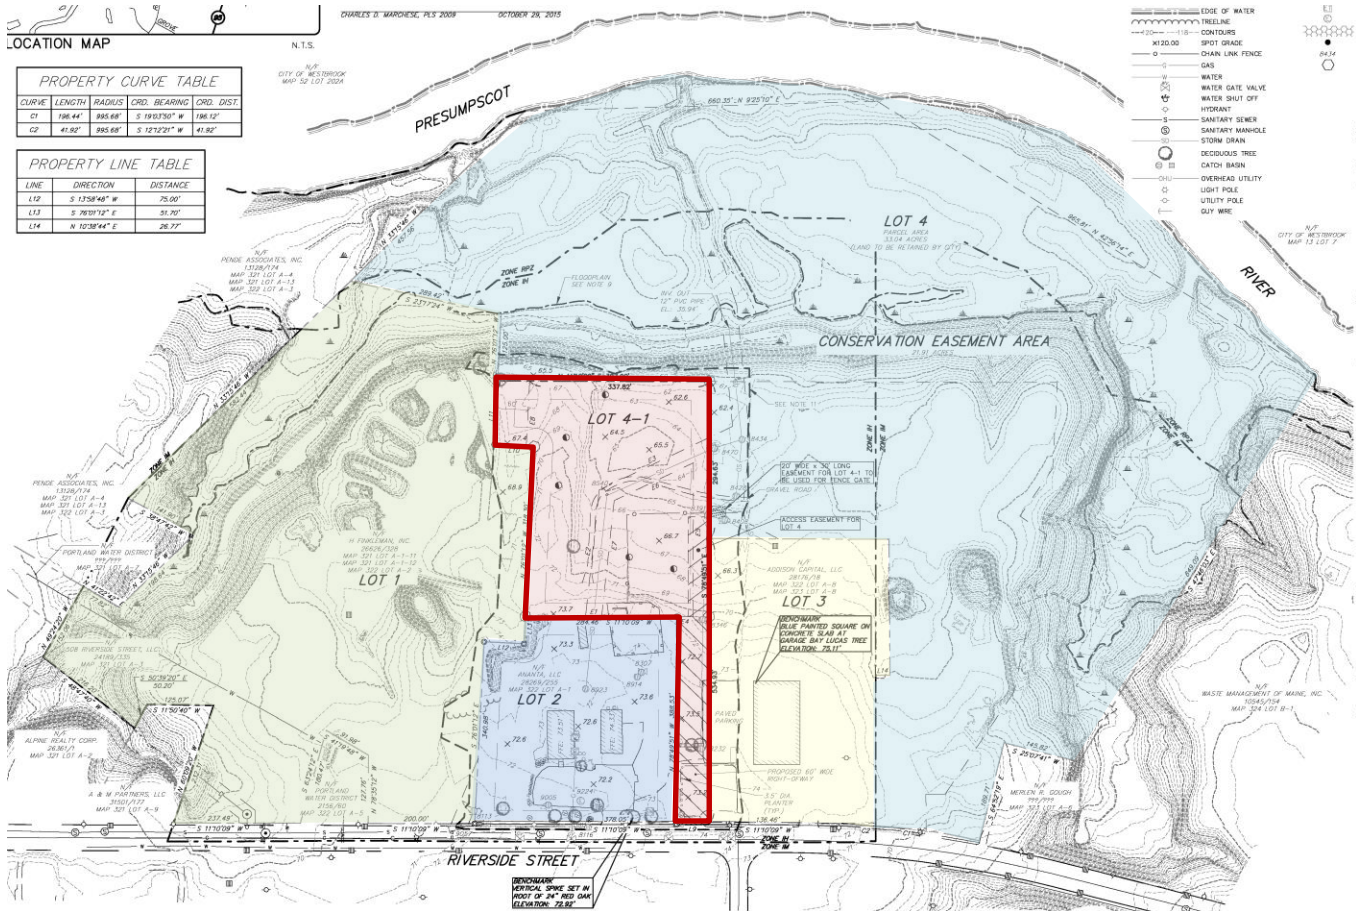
Draft subdivision plat, showing Suburban Propane site (Lot 4-1)
